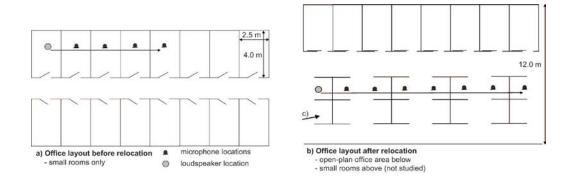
Floors plans indicating cellular layout on the left and new open-plan workspace on the right in the study by Kaarlela-Tuomaala (2009)
